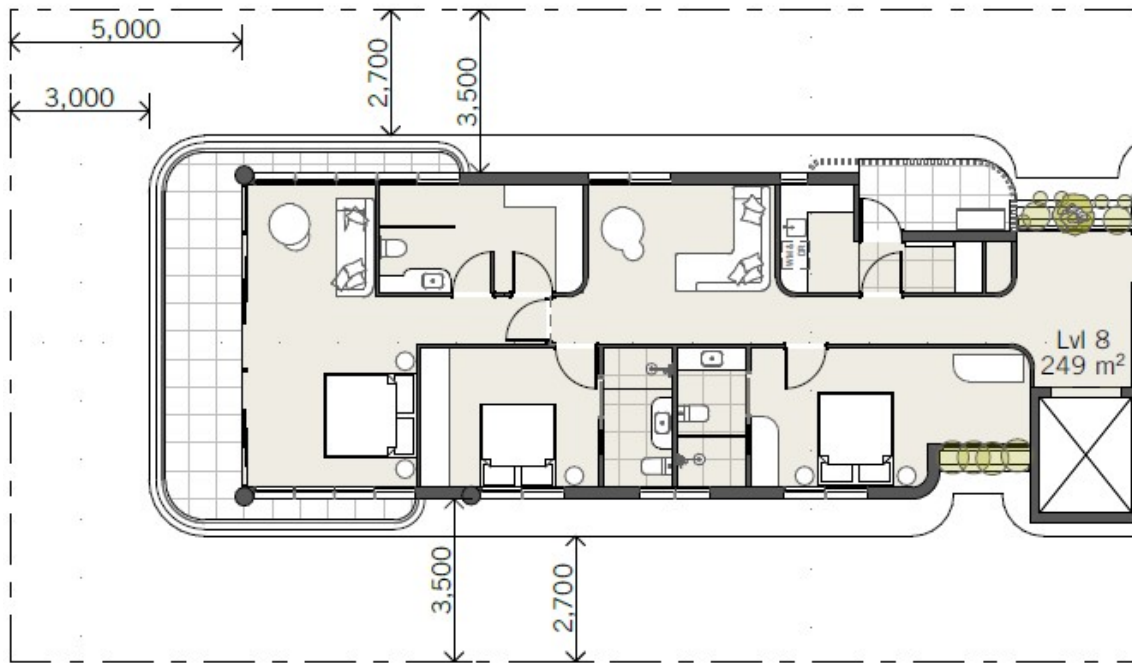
Partial level 8 floor plan (Source: Lightwave Architecture)
